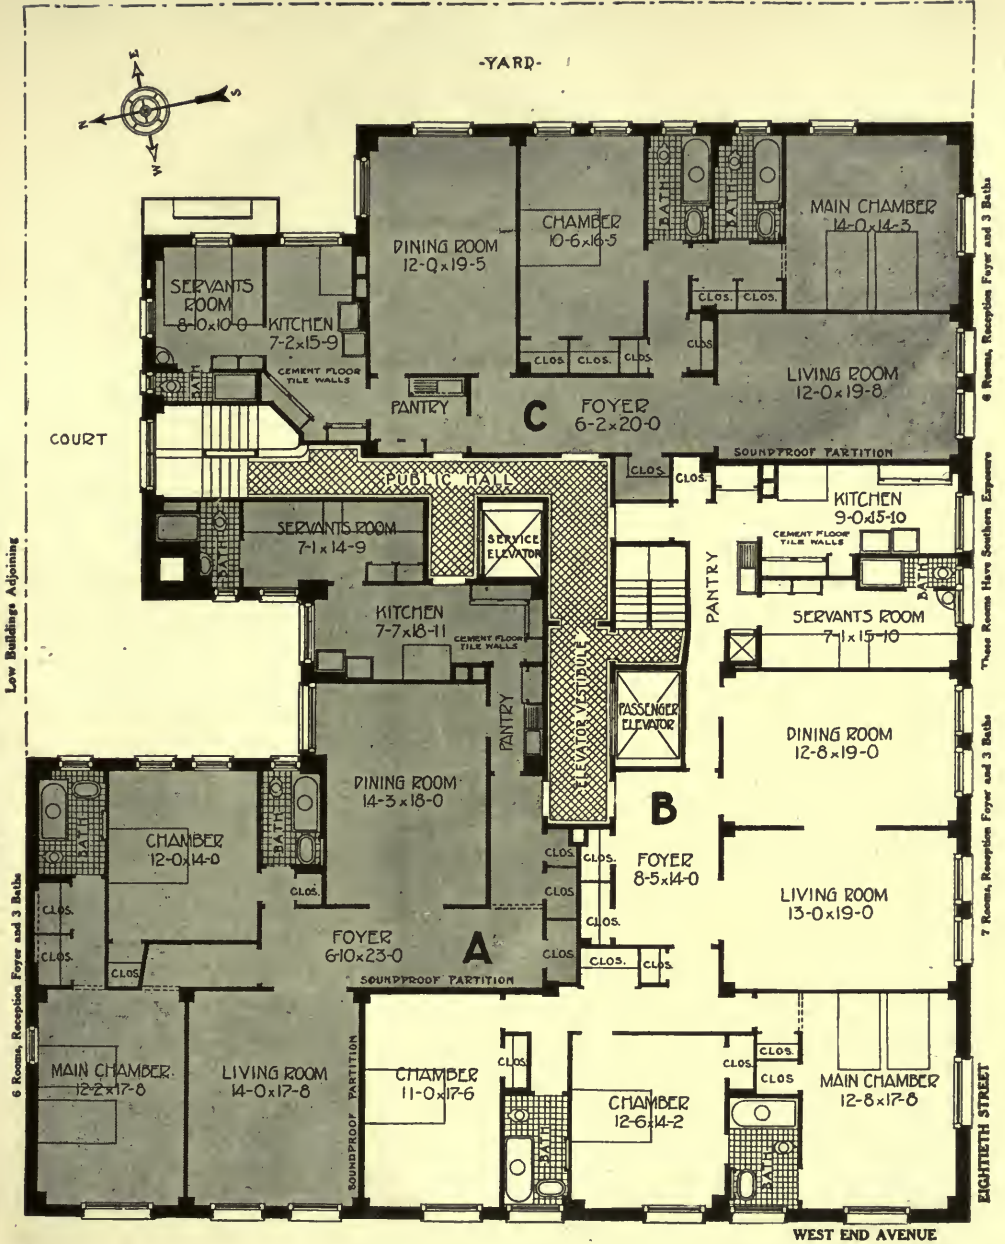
TYPICAL UPPER FLOOR PLAN—NO. 420 WEST END AVENUE, NEW YORK CITY. SCHWARTZ & GROSS, ARCHITECTS.
